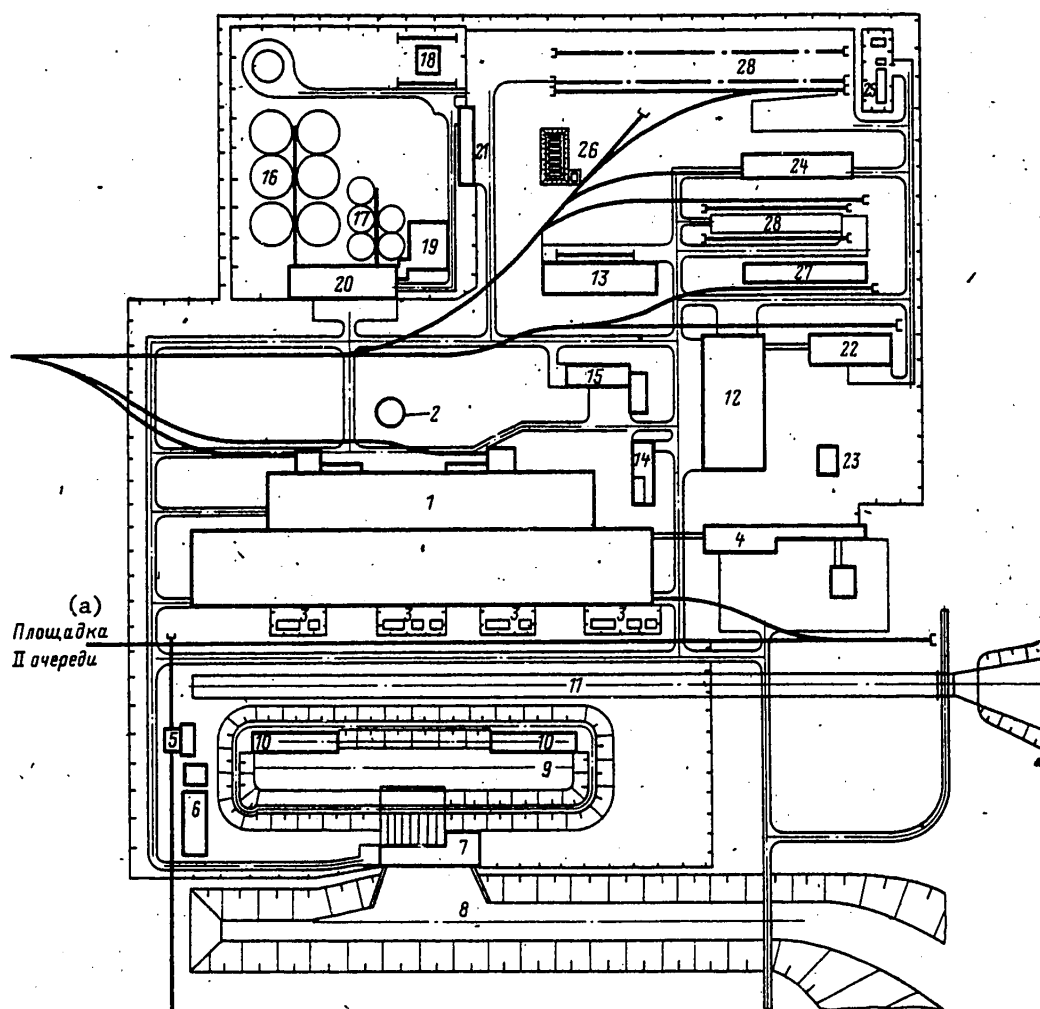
Master plan diagram of a nuclear power plant. 1 -- main facility; 2 -- vent pipe; 3 -- open transformer installation; 4 -- administrative and general services building and dining room; 5 -- transformer inspection tower; 6 -- oil station; 7 -- service water supply pumping station; 8 -- supply channel; 9 -- delivery basin; 10 -- water intake structures; 11 -- discharge channel; 12 -- combined auxiliary facility; 13 -- diesel generator plant; 14 -- compressor station; 15 -- nitrogen-oxygen station; 16 -- liquid waste storage; 17 -- wastewater tank; 18 -- solid waste storage; 19 -- gas folding chambers (UPAK); 20 -- discharge water treatment facility; 21 -- garage and washing of transport systems; 22 -- chemical reagents storage; 23 -- hydrogen receivers; 24 -- fresh fuel storage; 25 -- acetylene generator plant; 26 -- diesel fuel storage; 27 -- graphite storage; 28 -- open area with gantry cranes.
